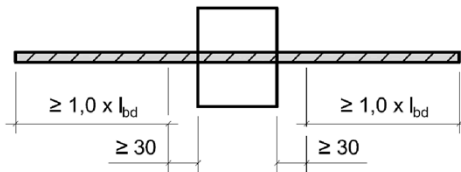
Horizontal straight bar for Schöck Isokorb® Type H-NN, top view
